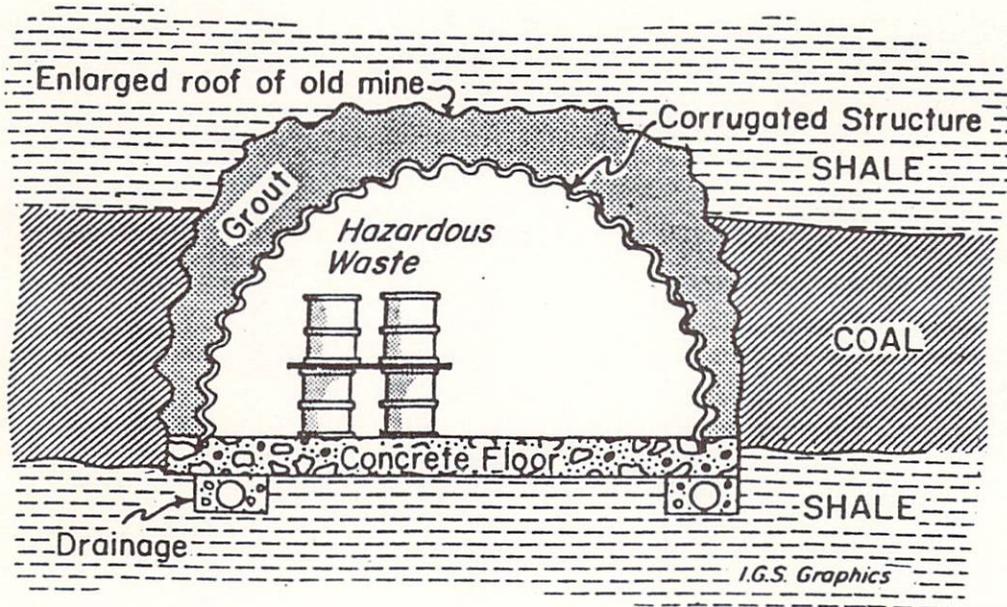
One Design for Storage of Hazardous Waste in an Abandoned Coal Mine
